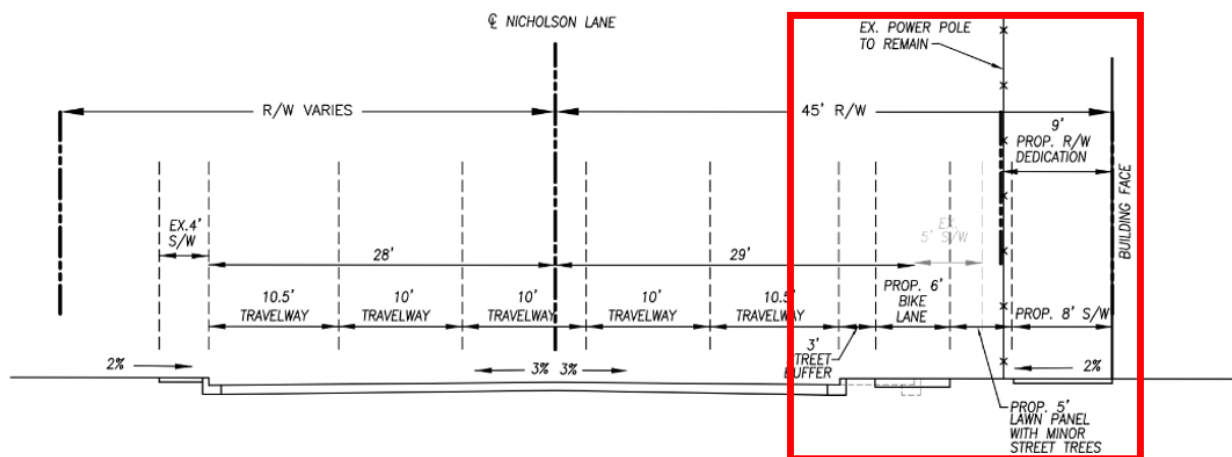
Nicholson Lane Cross-Section, Looking East with Subject Property Frontage in Red
